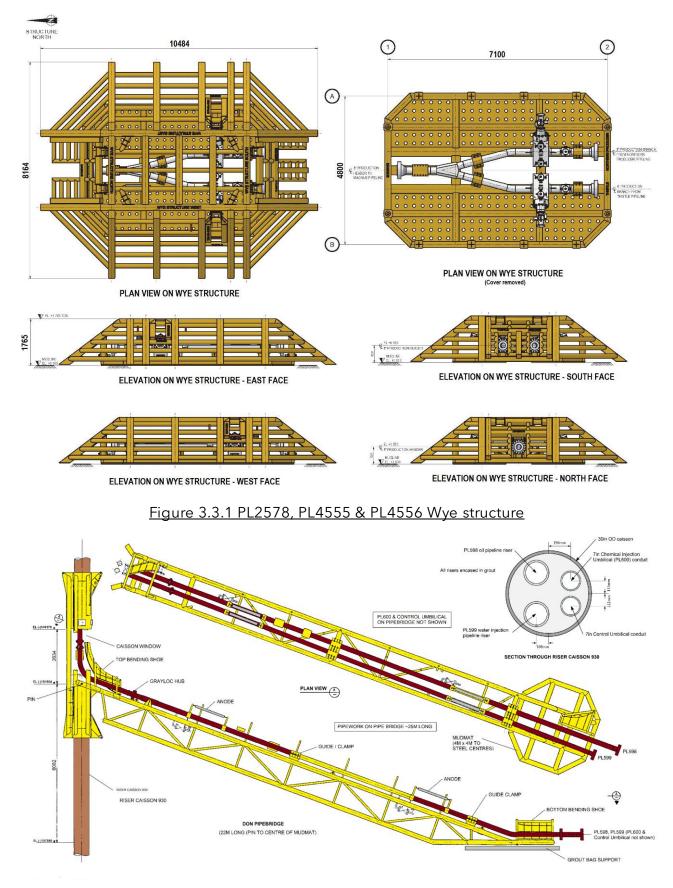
Don Pipebridge (next to riser caisson 930 on Thistle jacket)
